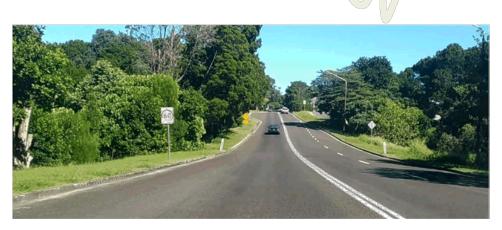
CH 1,300 - View to the WEST - Reinforcing 60 km/h speed zone sign
